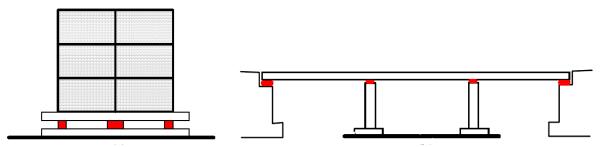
Example of isolator introduction in buildings and bridges ([6])
